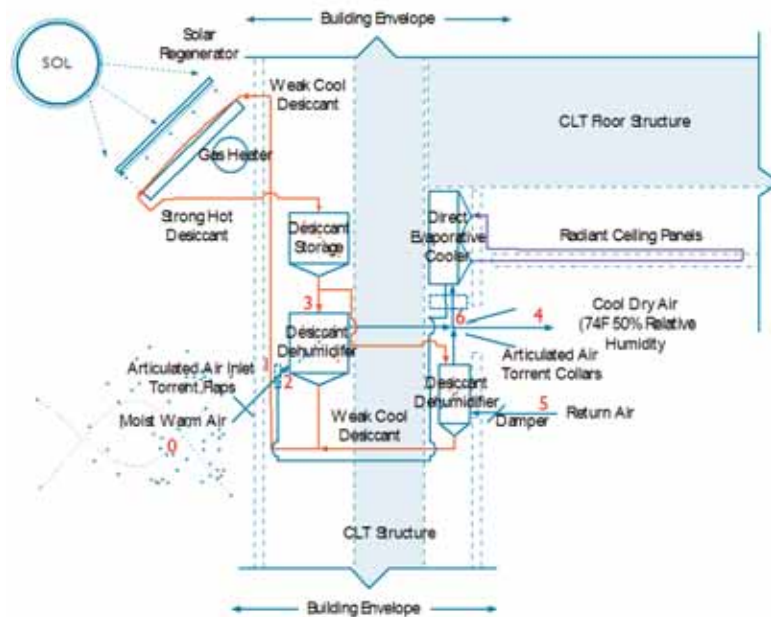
A detail sketch that shows solar liquid desiccant air conditioning building envelope system.
